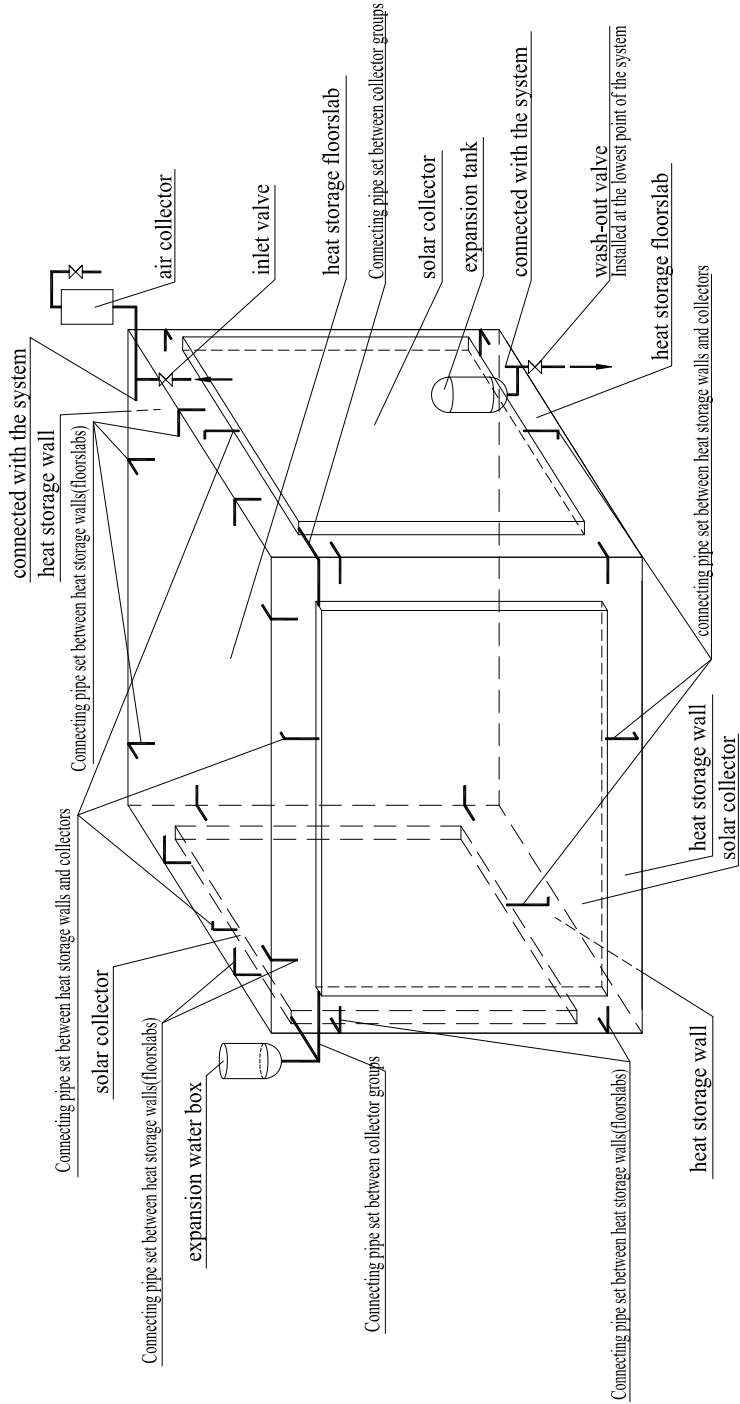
Installation of solar collector and heat storage wall (floorslab)
